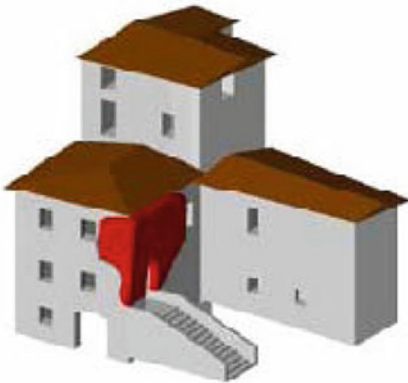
Combined overturning of a multi story wall (Milano et al. 2008)
